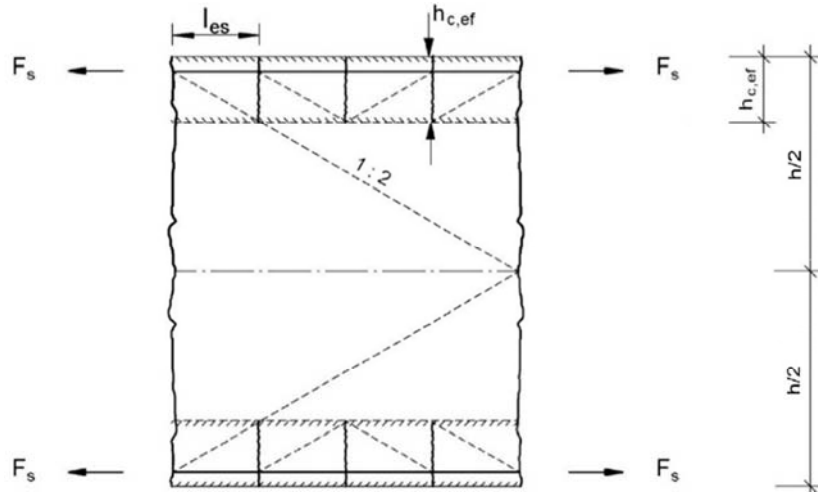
Mechanism of cracking in thick structural members with secondary cracks between two primary separation cracks..
